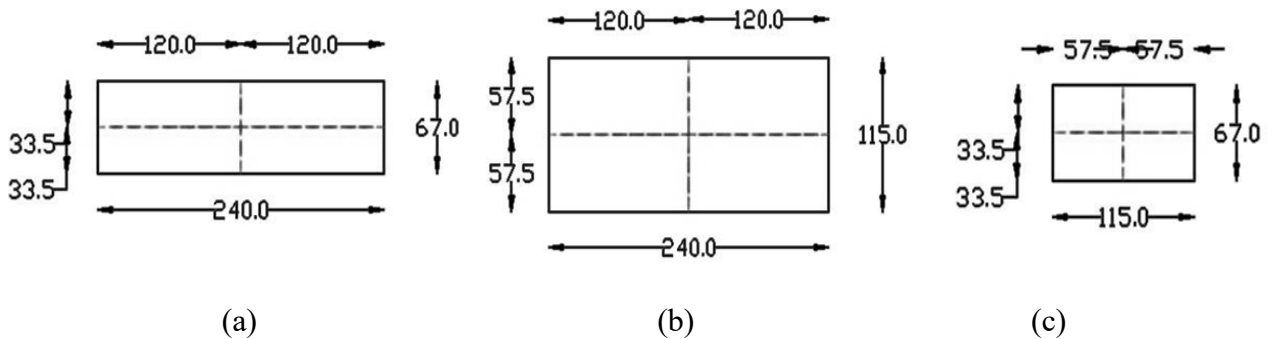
(a) Front / back elevation, (b) plan view, (c) side elevation of a full-scale solid clay brick (Every unit is in mm).
